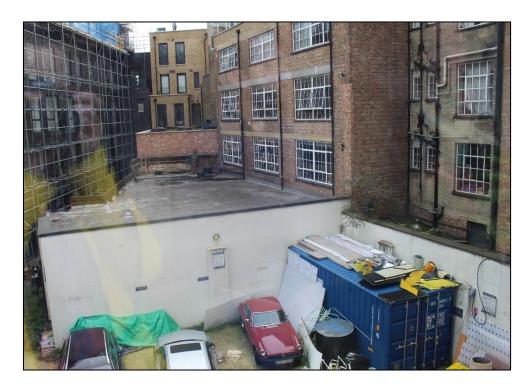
Elevated view from Britannia House showing interior of car park and modern single storey utilitarian buildings
